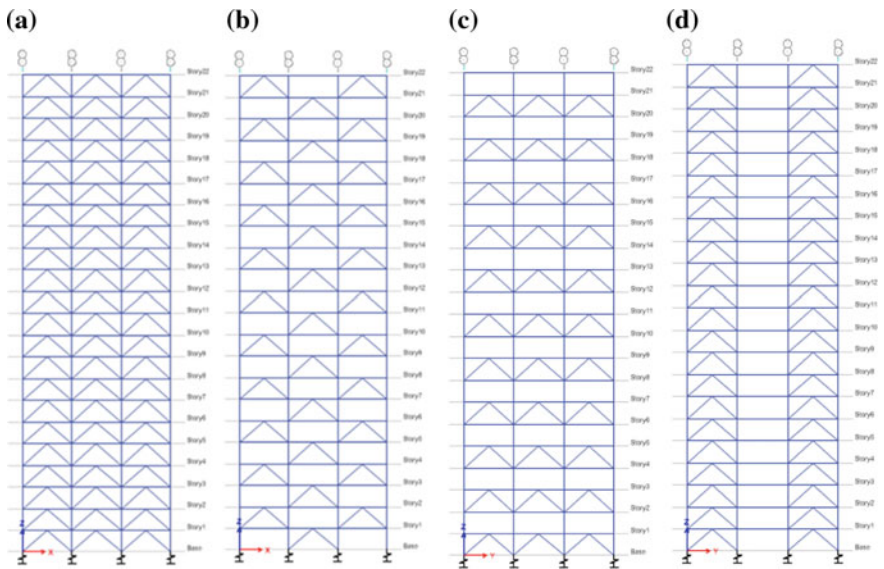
Elevation of 22 storey diagrid buildings with inverted V bracing pattern arrangement (a whole, b alternate, c horizontal, d vertical)
